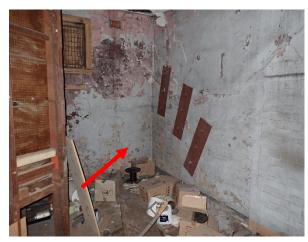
Lot 4, Old Office Building, lead based white paint to the ground floor internal brick walls
